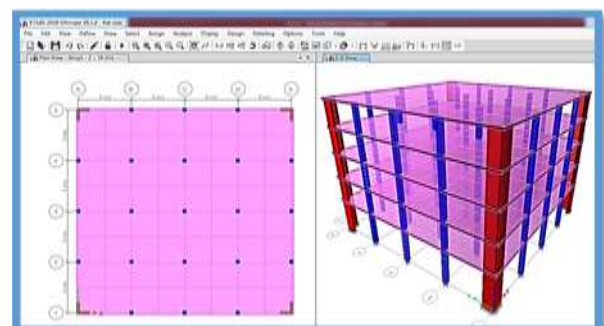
Flat slab with shear wall at exterior corners (model 2)
